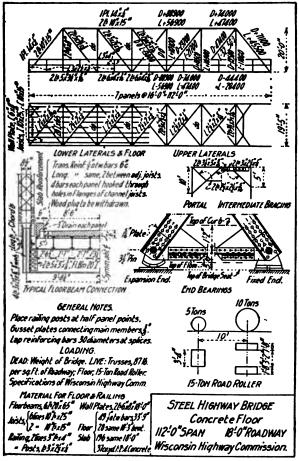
High Truss Steel Highway Bridge. Wisconsin Highway Commission.
